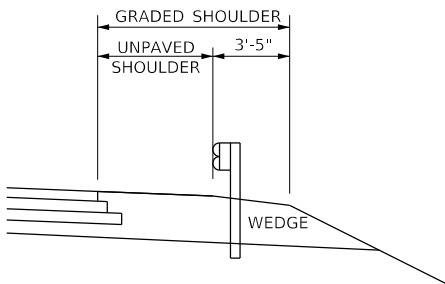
PAVEMENT DESIGN
